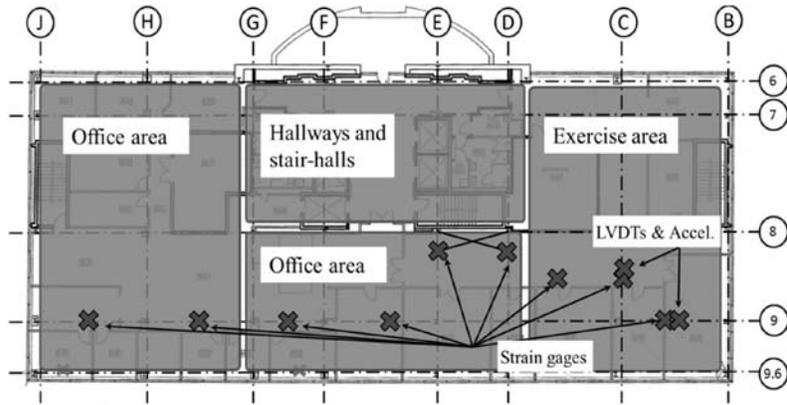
Sixteenth floor plan, different occupancies and wired sensor locations.
